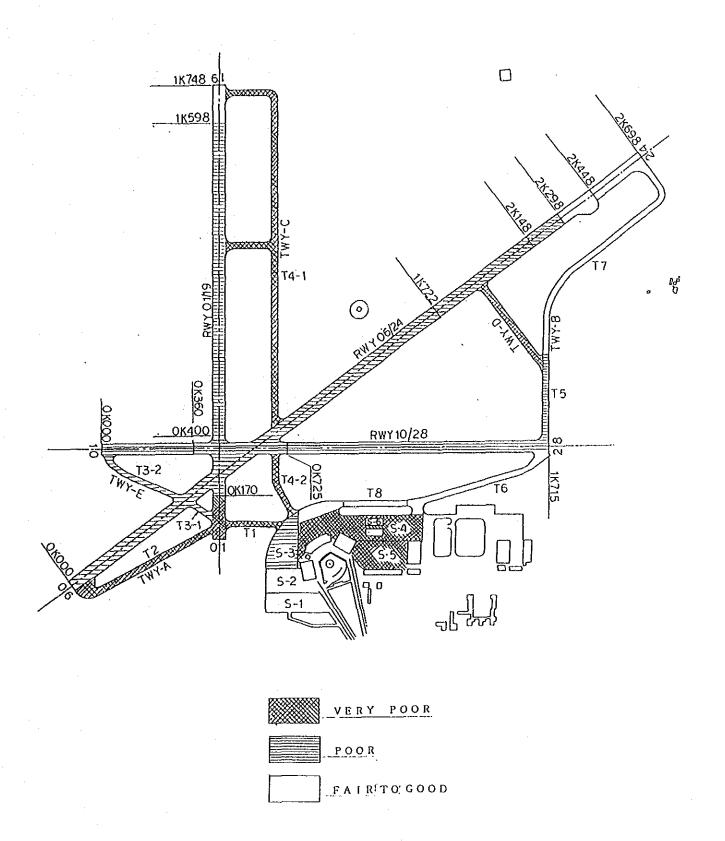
SURFACE CONDITIONS OF PAVEMENT
